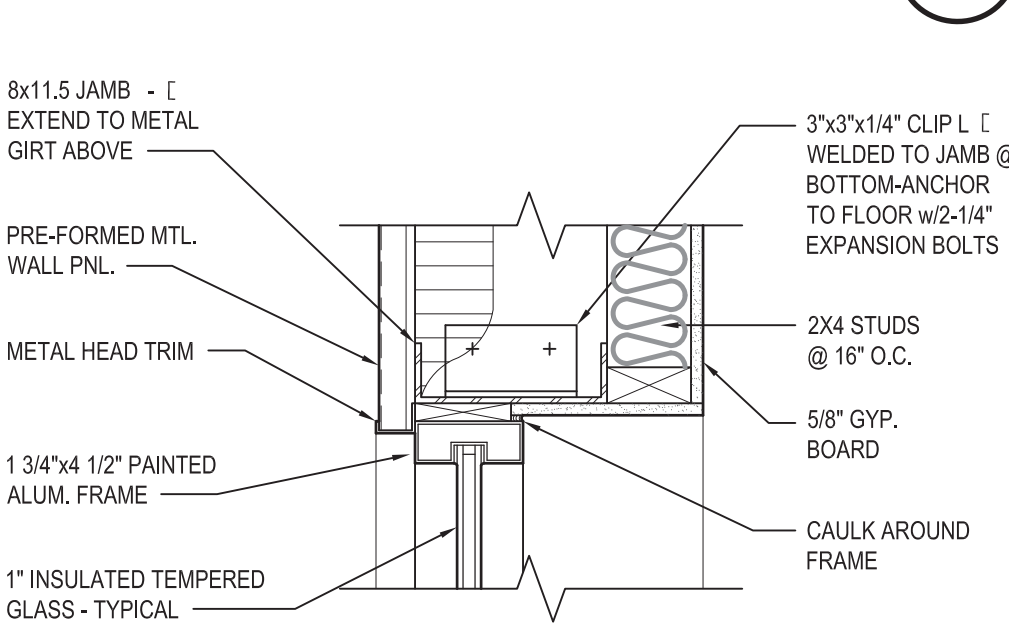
DETAIL - EXTERIOR DOOR JAMB (HEAD SIM.)
